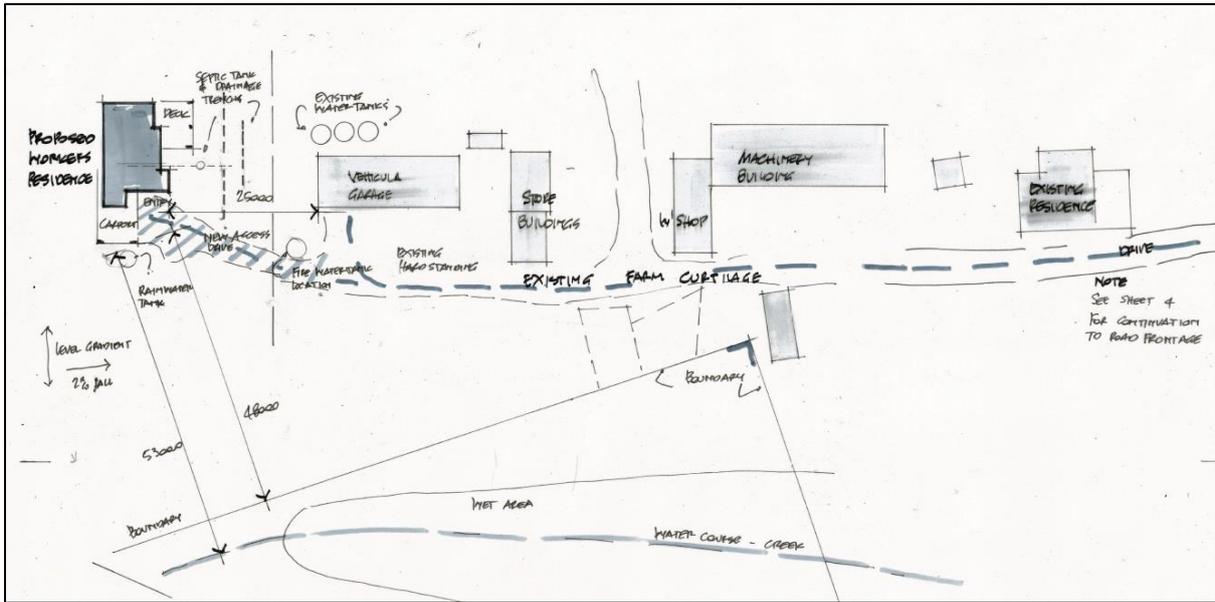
Farm dwelling siting, including access and driveway configuration (Source: Building Design Service).
